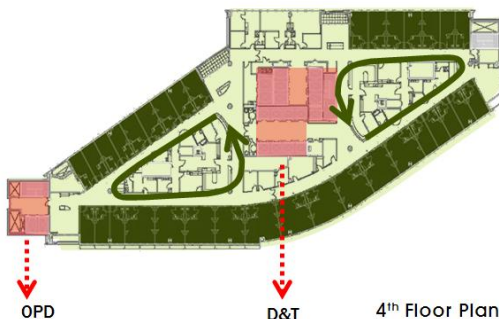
New Yonsei Severance Hospital - Ward Floor Plan
